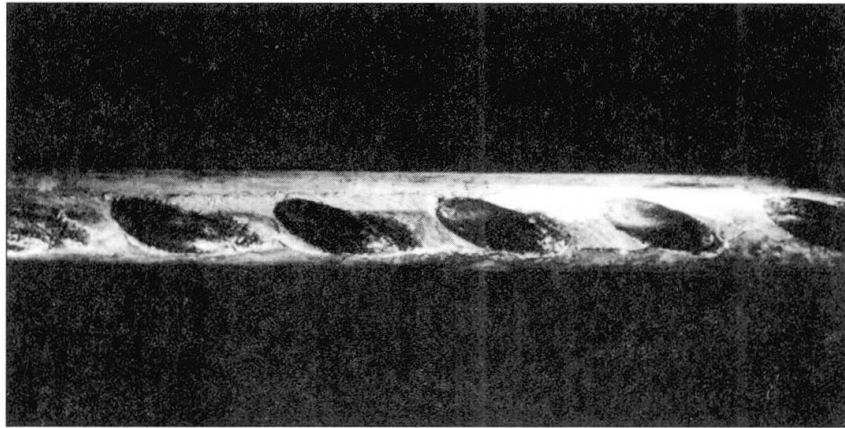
Fretting damage on 5mm wire from hanger cable.
